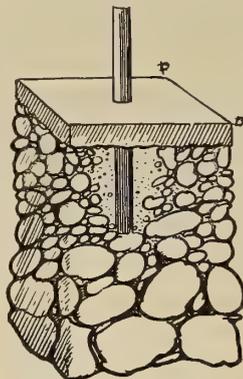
How the concrete foundation was made. The firmly set iron rod assures stability
